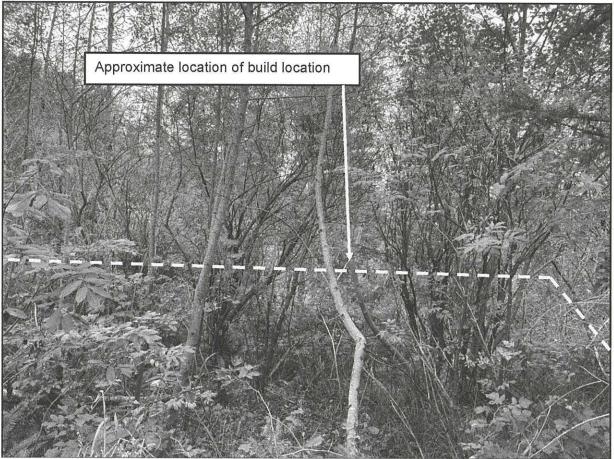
Photo looking west toward the proposed residence location. Note that the drilling rig mast can be seen through the trees where it is set up below at location B-1.
